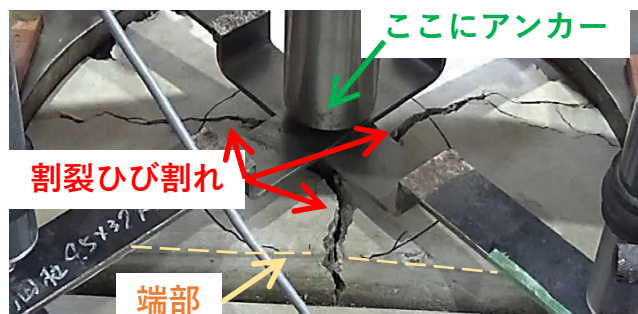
Splitting failure observed around the anchor near the concrete member's edge
